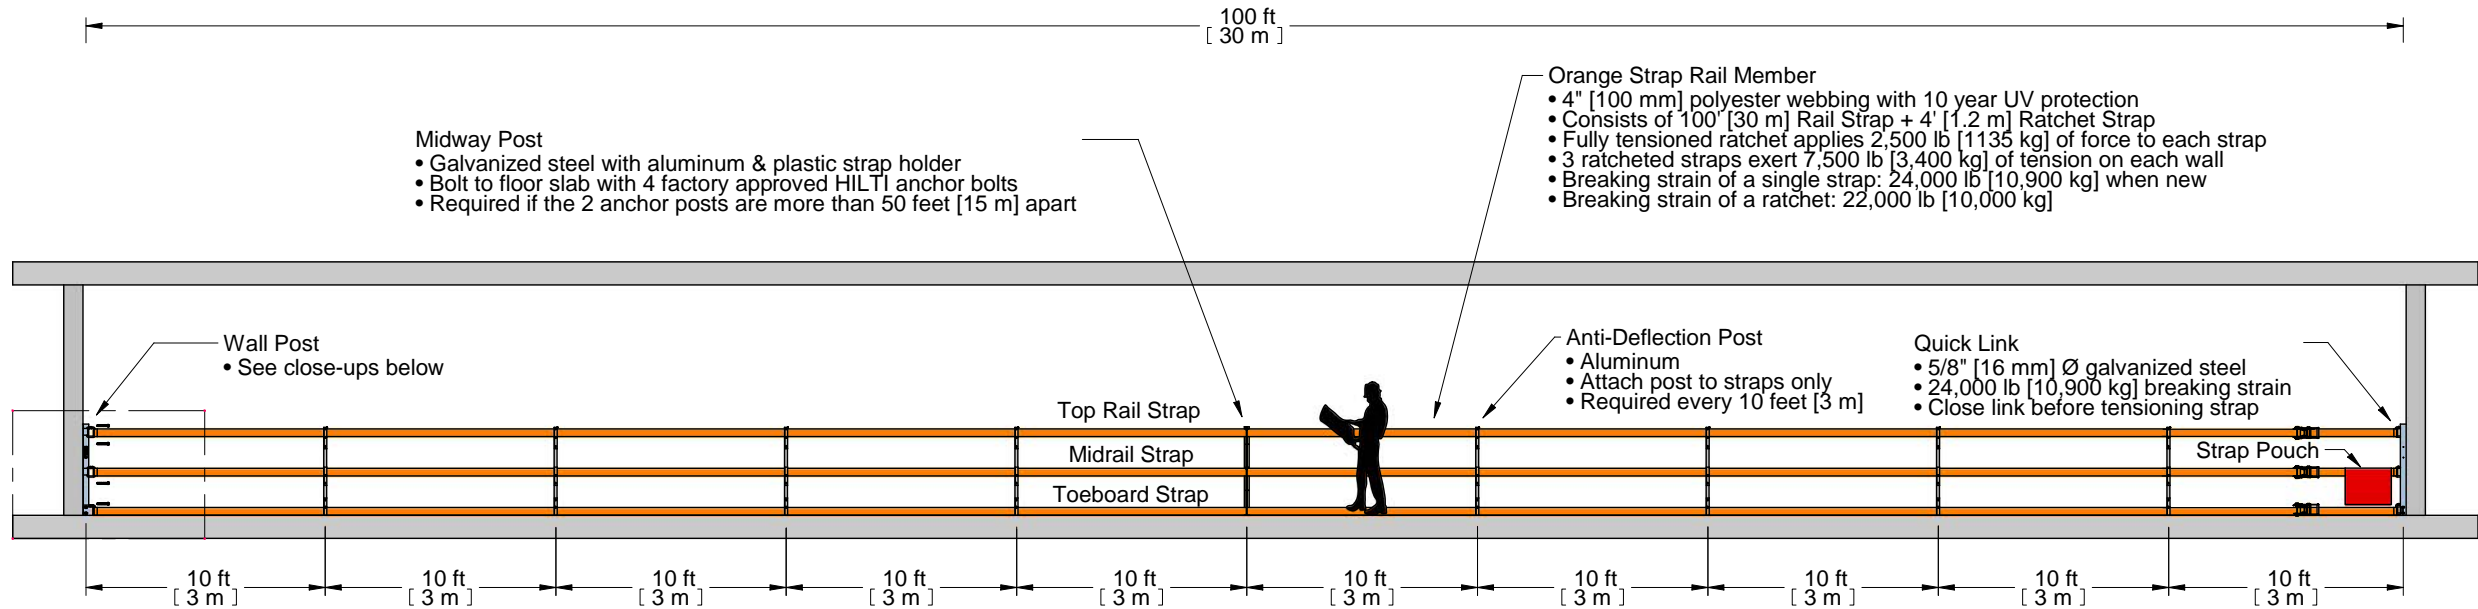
Drawing B: Using 2 Wall Posts to Anchor a 100' x 45" [30 m x 1.14 m] Guardrail System
